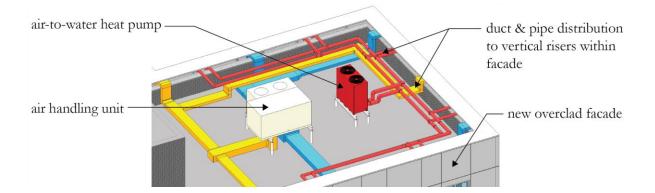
Typical rooftop equipment layout including heat pump, AHU, and duct and pipe distribution.
